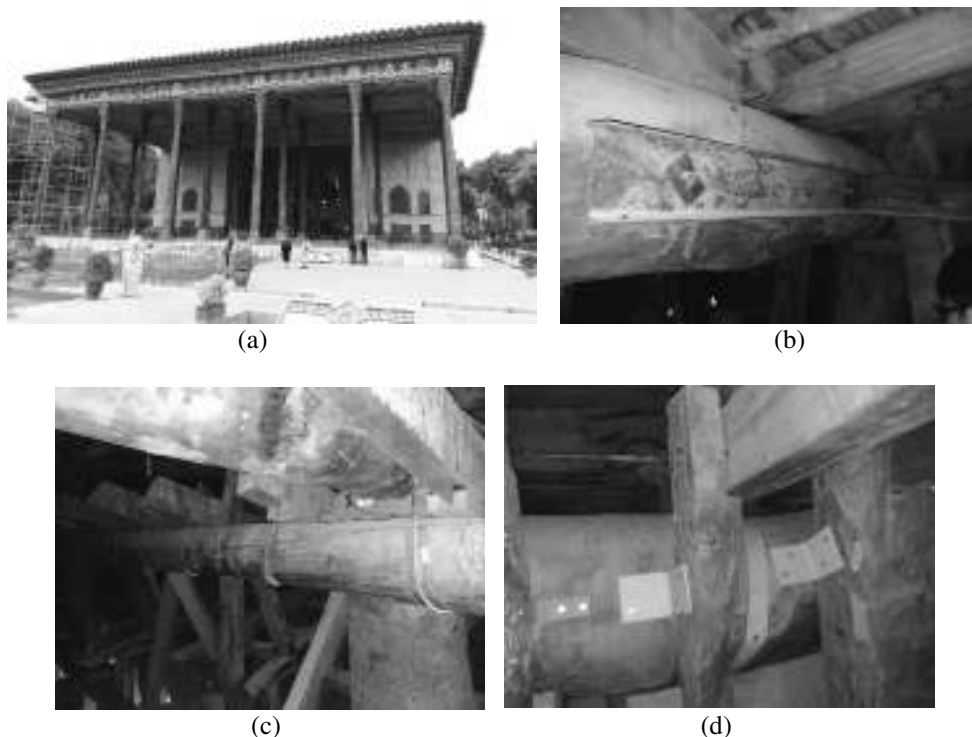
(a) Chehel Sutun building, Isfahan, 1647 A.D., use of (b) a steel profile in the 1960's and 1970's, (c) aluminium stirrups, (d) aluminium angles in 2016
